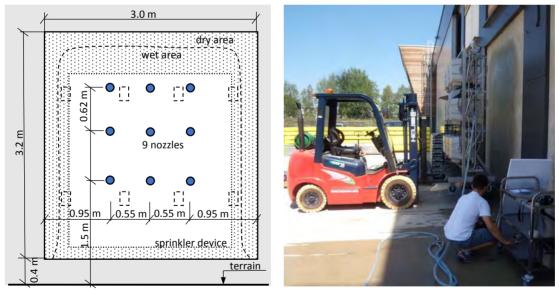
Left – the front view on the test field with position of sprinklers and wooden beam ends. Right – the sprinkler device positioned in the front of the test field.
